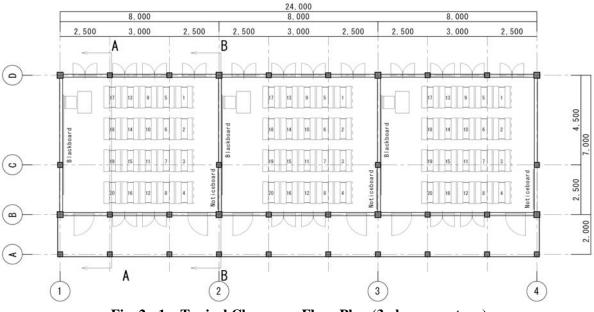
1 Typical Classroom Floor Plan (3-classroom type)
